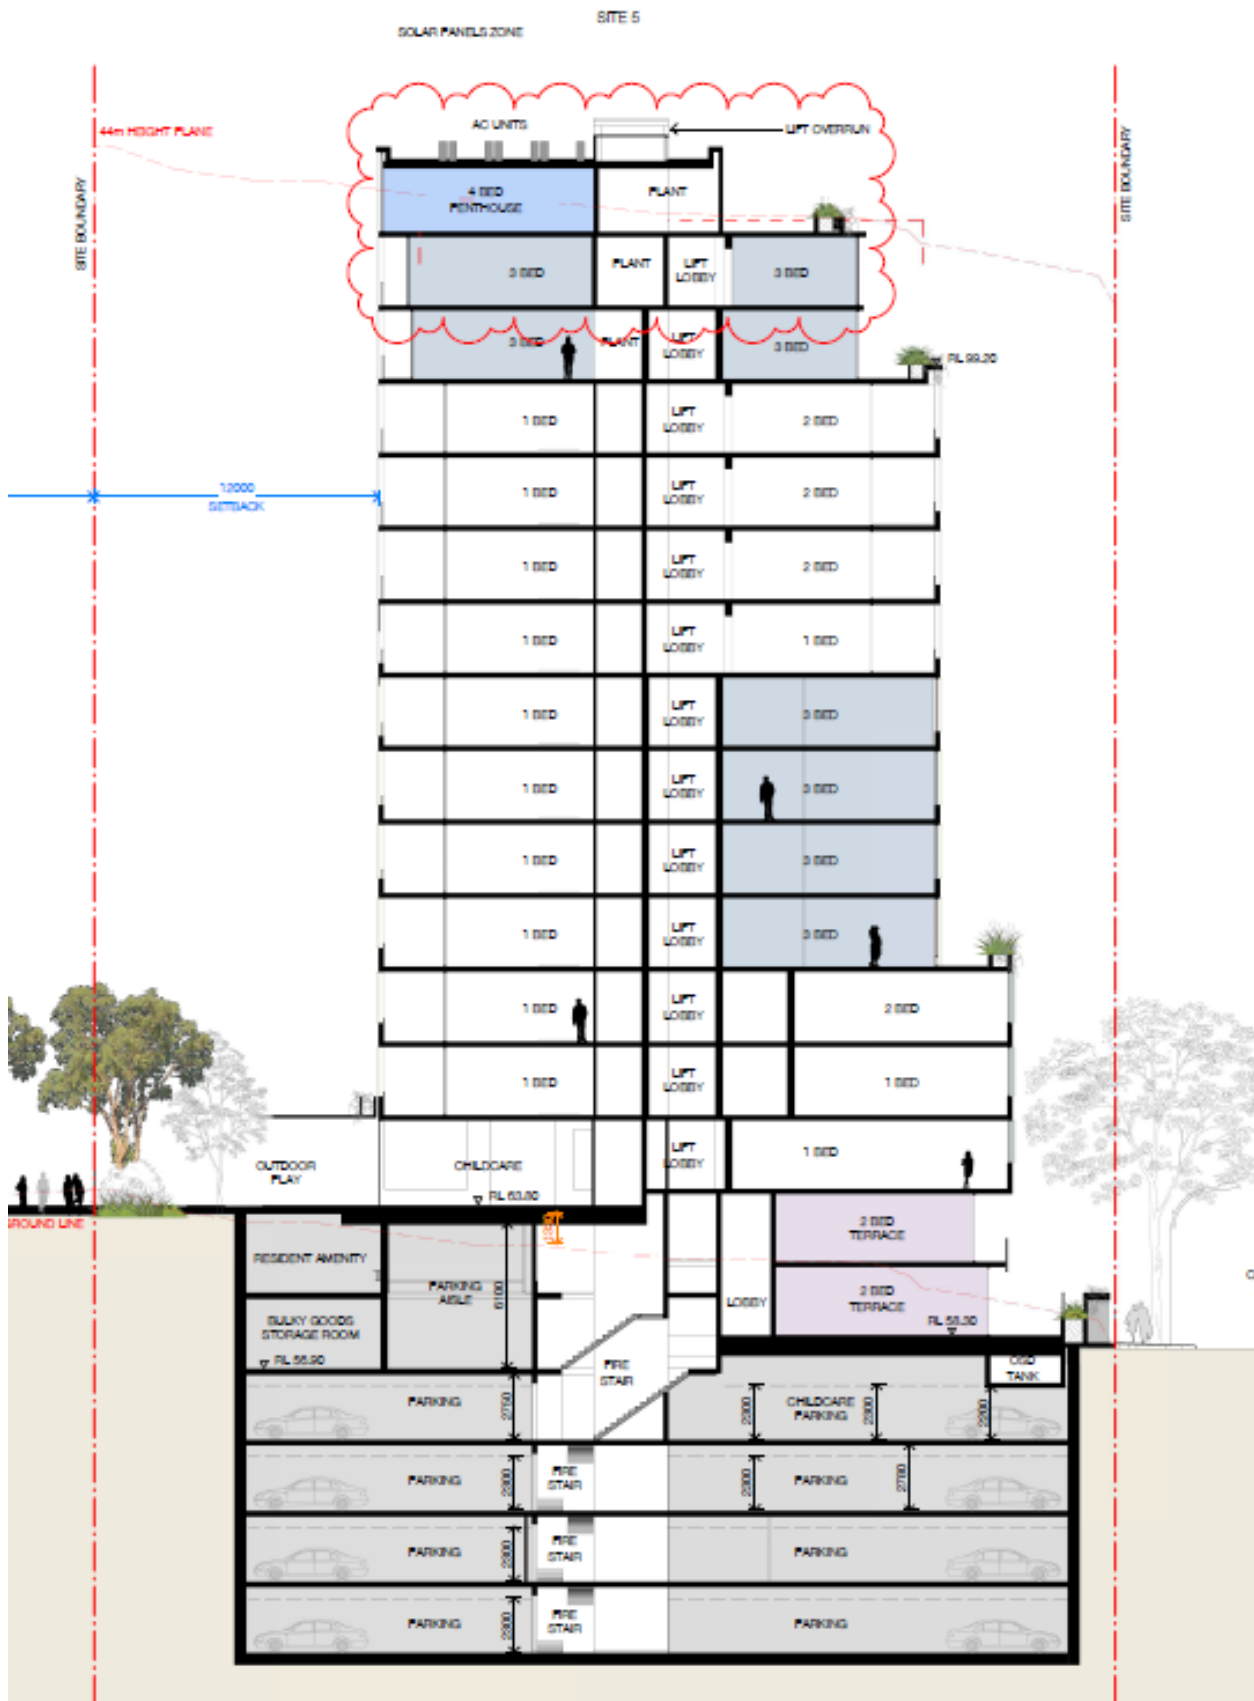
Proposed Breach to the Maximum 44m Building Height Plane
